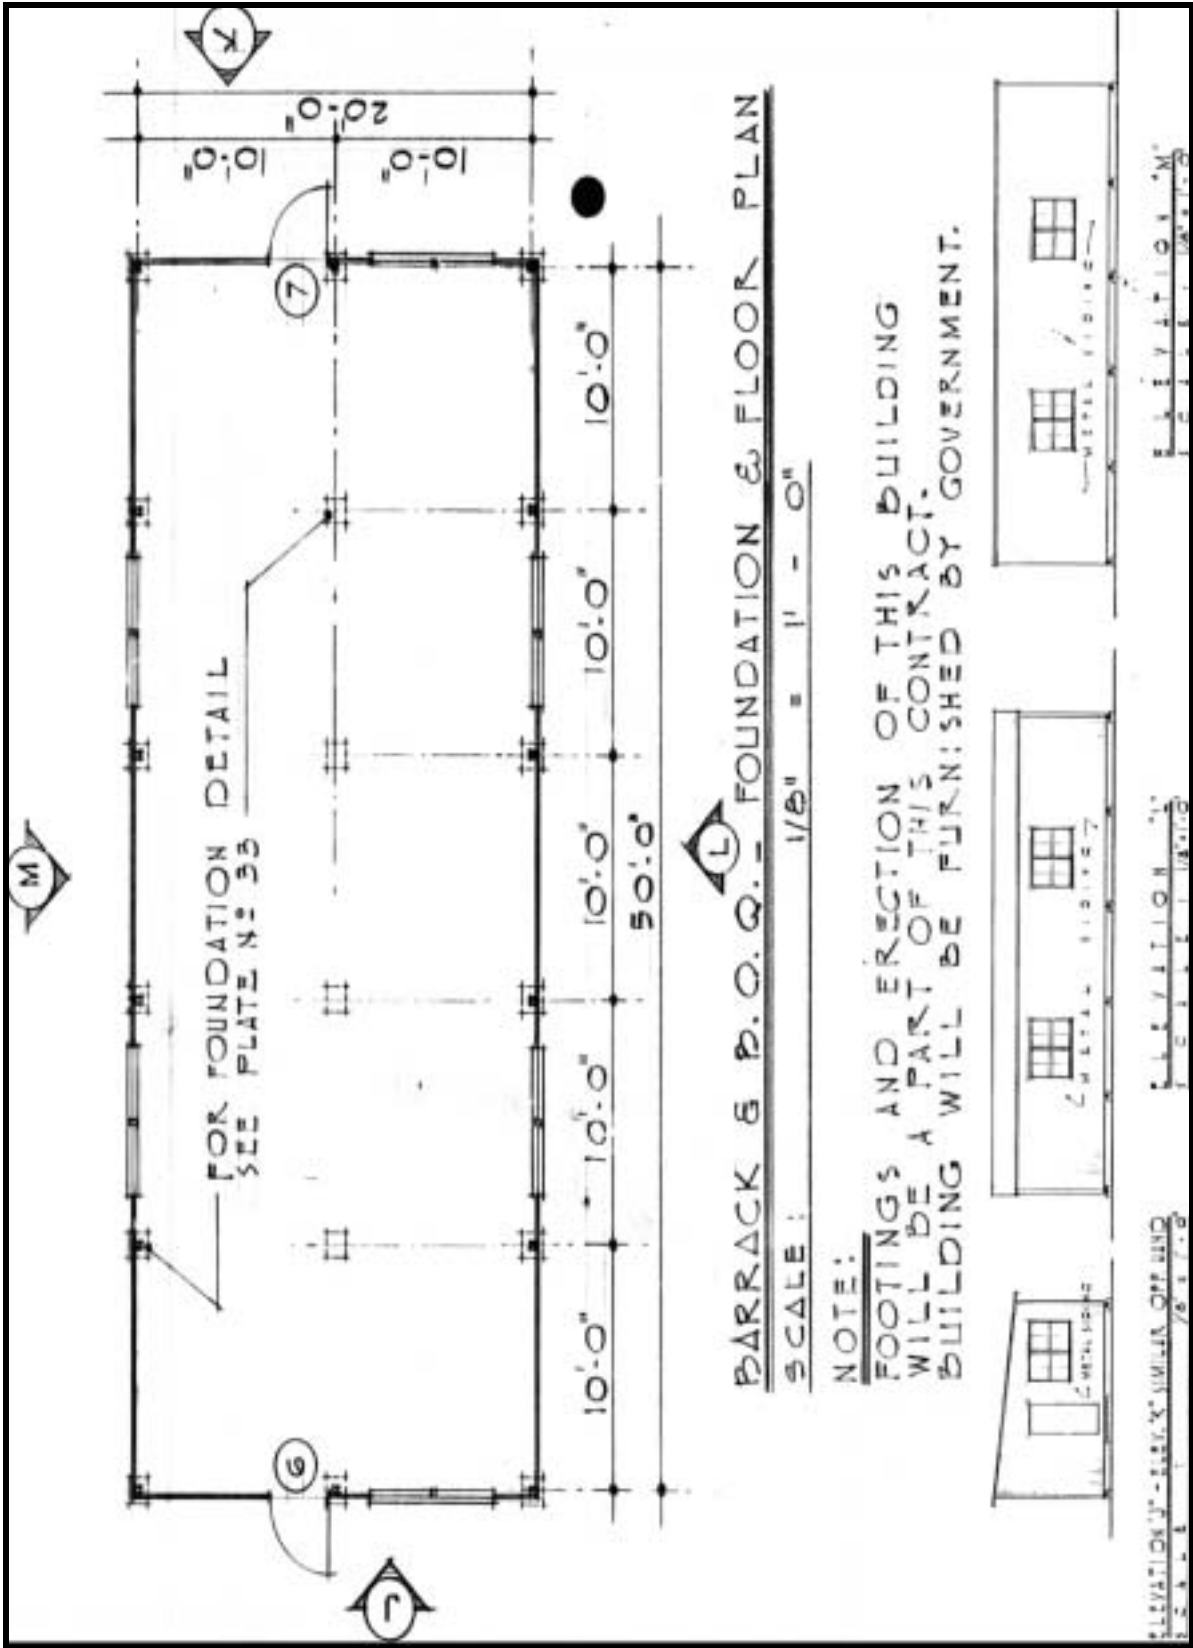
C-hut, floor plan and elevations, Ft. Bliss (1966, revised 1967) (Engineering, Ft. Bliss).
